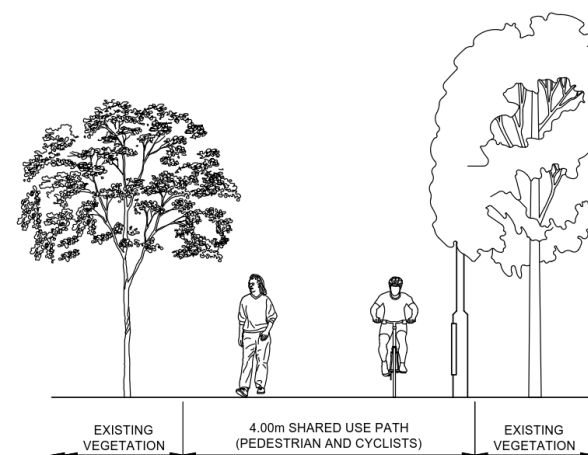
Cross Section Route 5 – Old Craighall Road to Whitehill Farm Road
